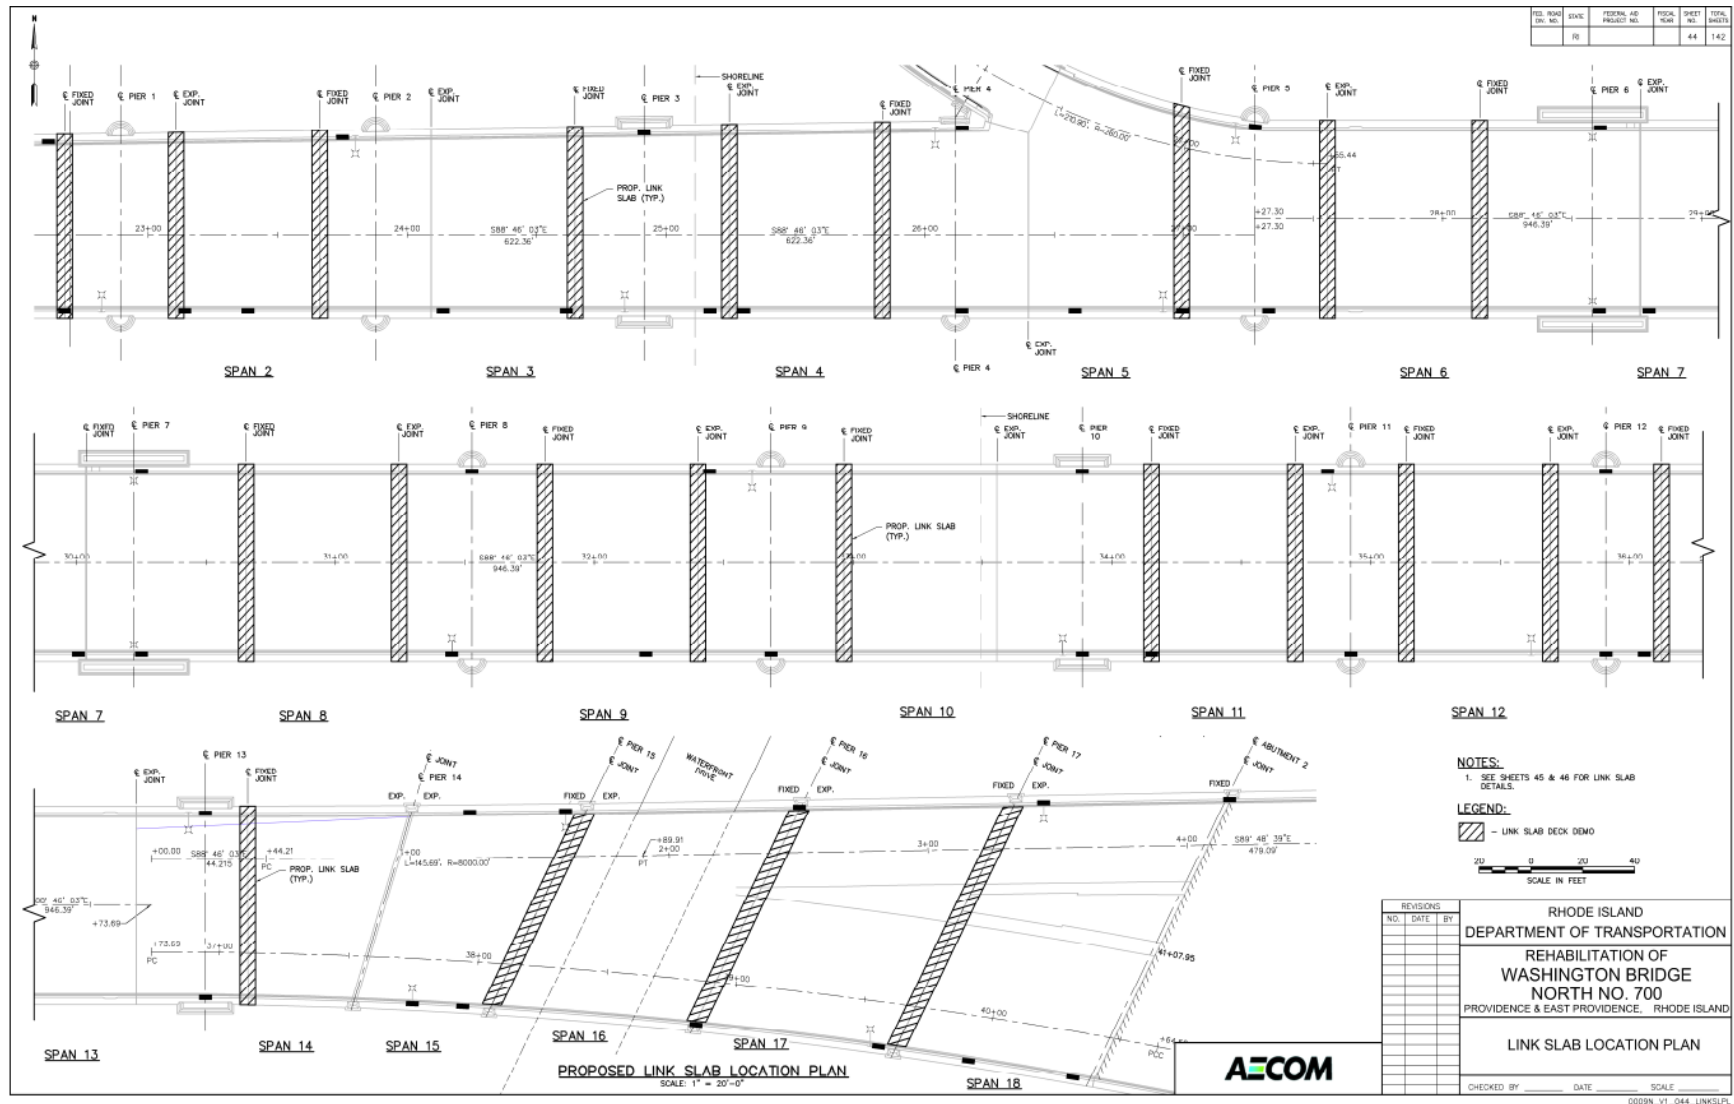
Link slab Location Plan from 2016 Rehabilitation plans, Sheet 44, RIDOT Contract 2016-CB-059, 2016.
